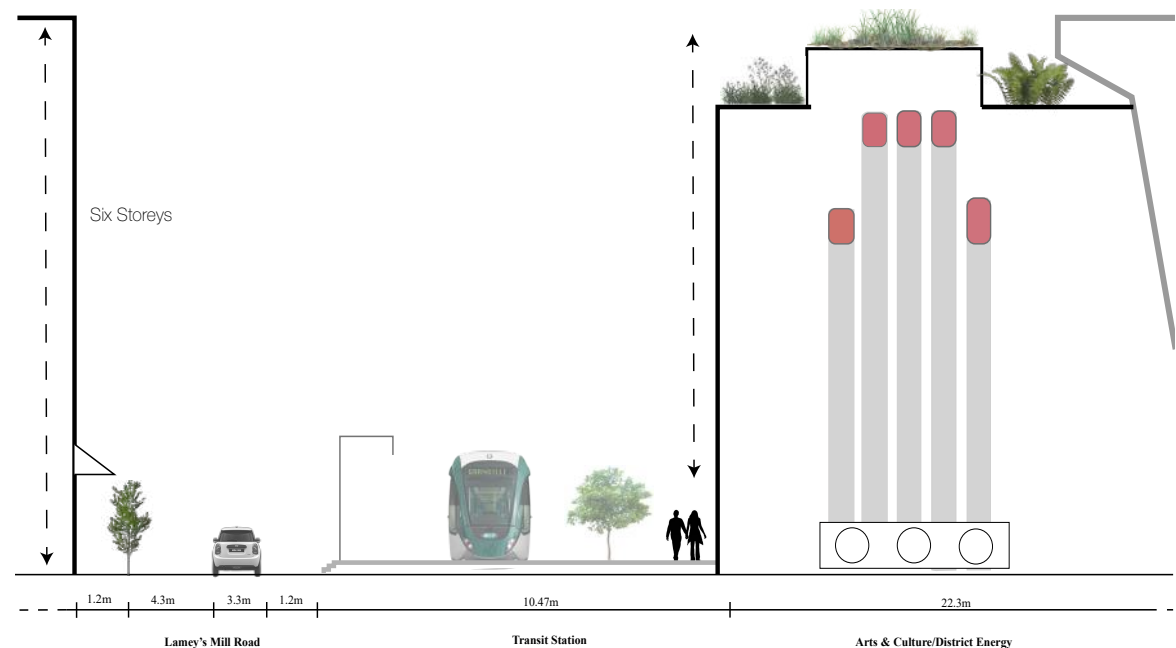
Cross section looking east at Granville and Lamey's Mill Road.
